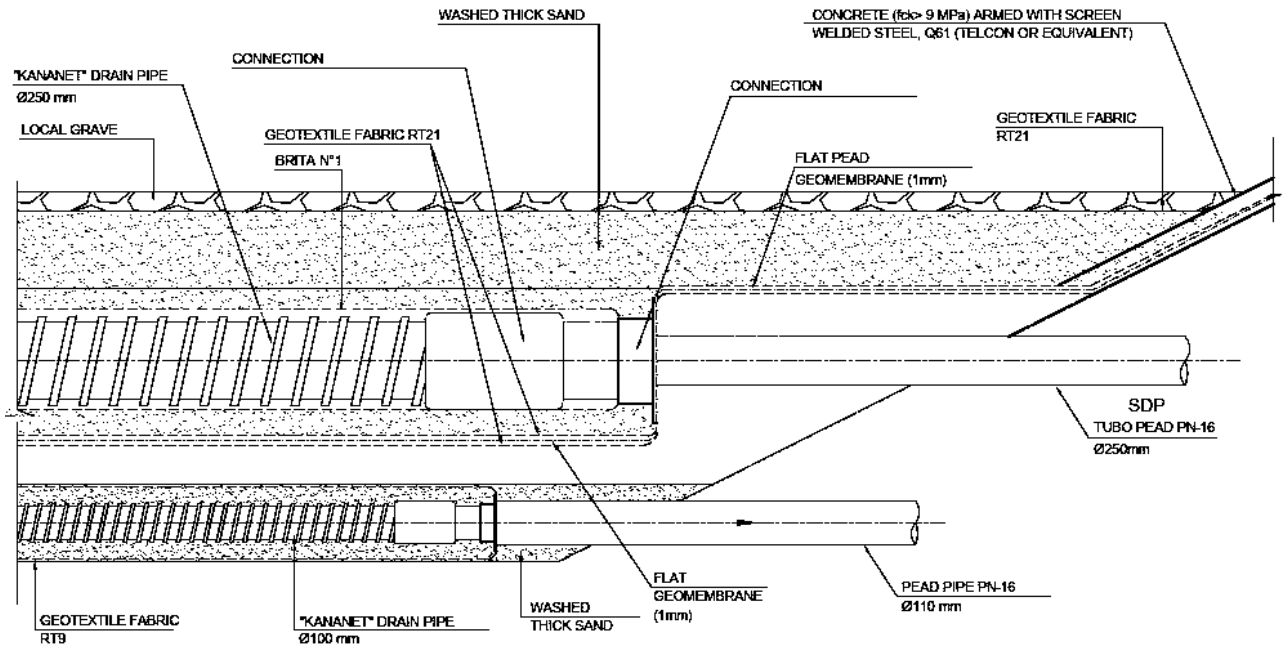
Bottom and Drainage Waterproofing System (typical design)
